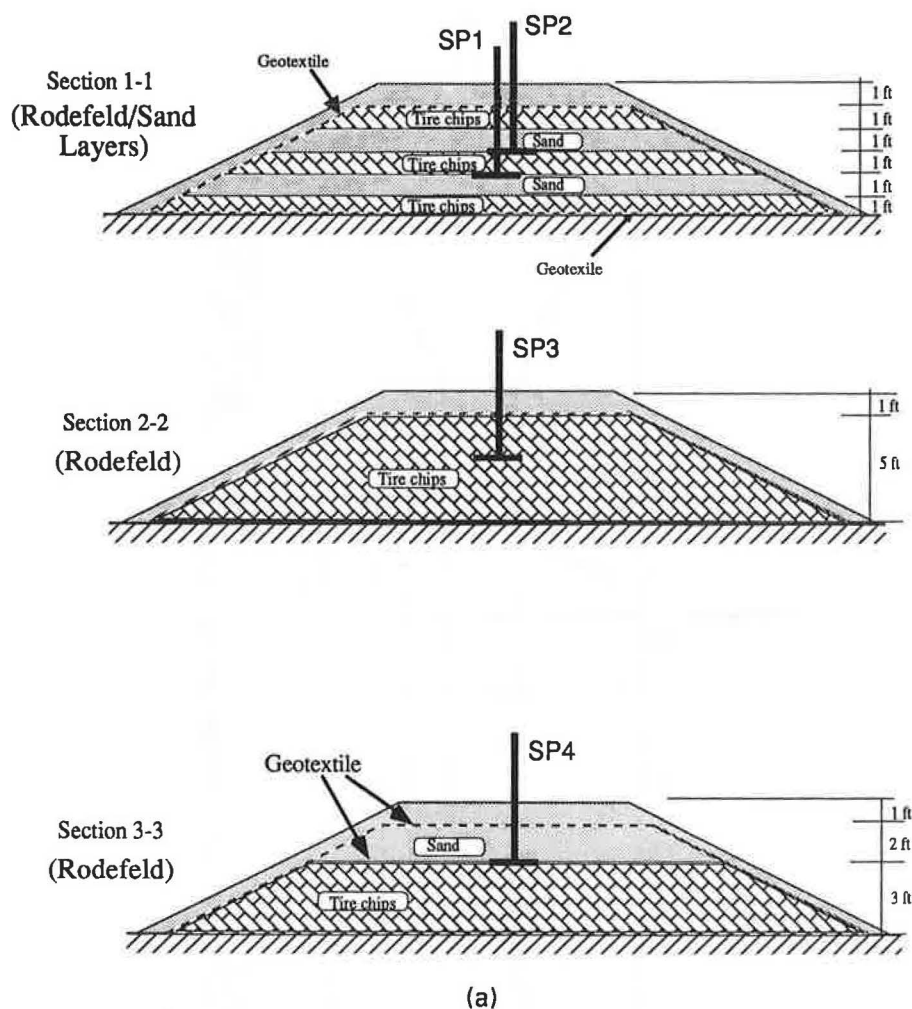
Elevation view of test embankment sections as designed: (a), Sections 1, 2, and 3; (b), Sections 4, 5, and 6. (continued on next page)
